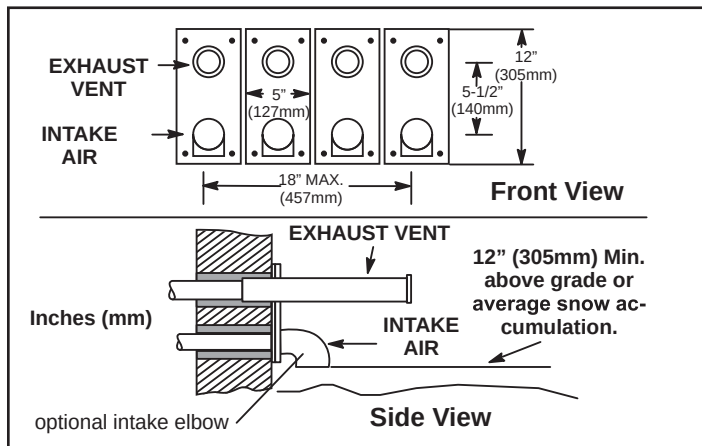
Optional Vent Termination for Multiple Unit Installation of Direct Vent Wall Termination
